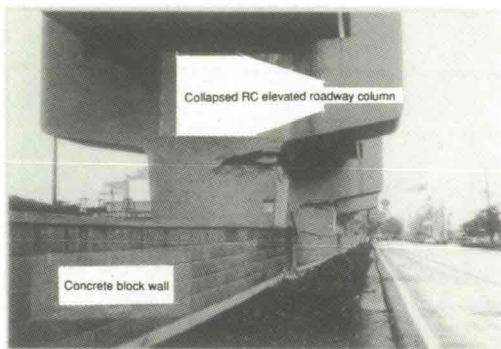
Fractured RC bridge pier of harbor by-pass
